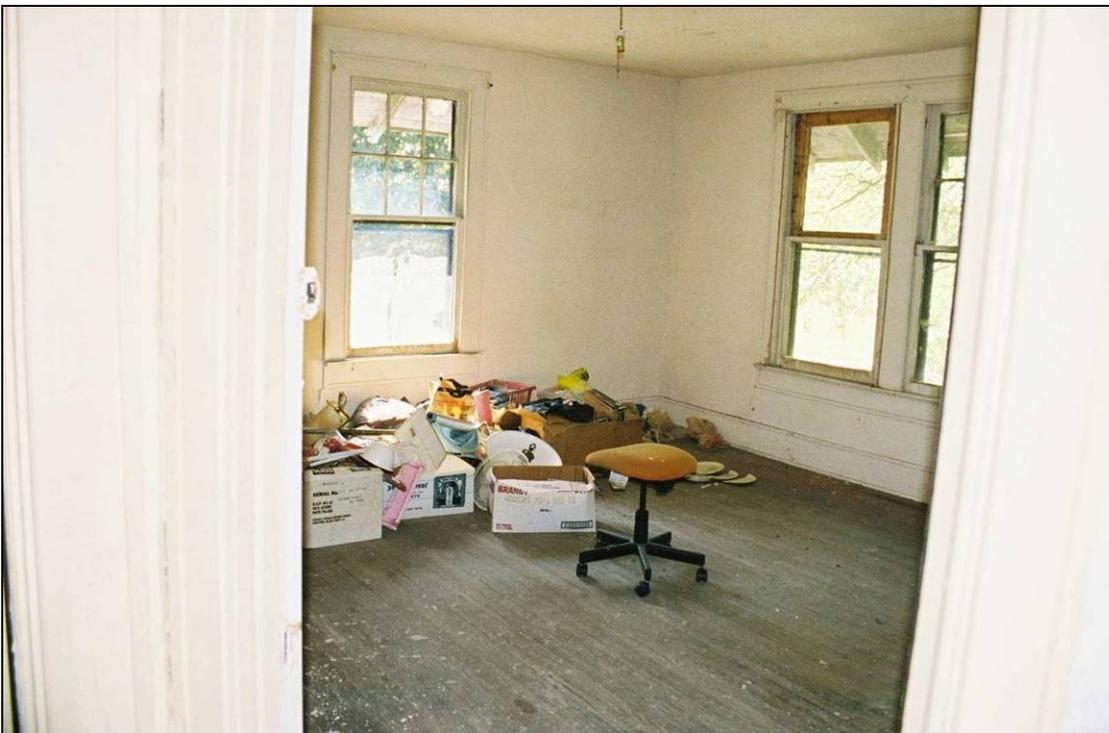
Spring Hope Teacherage: northwest upstairs bedroom
